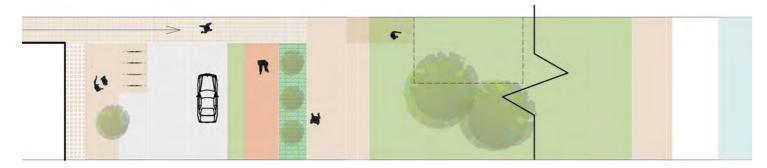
Illustrative section and plan for the coastal edge, West Shore Road and coastal park
